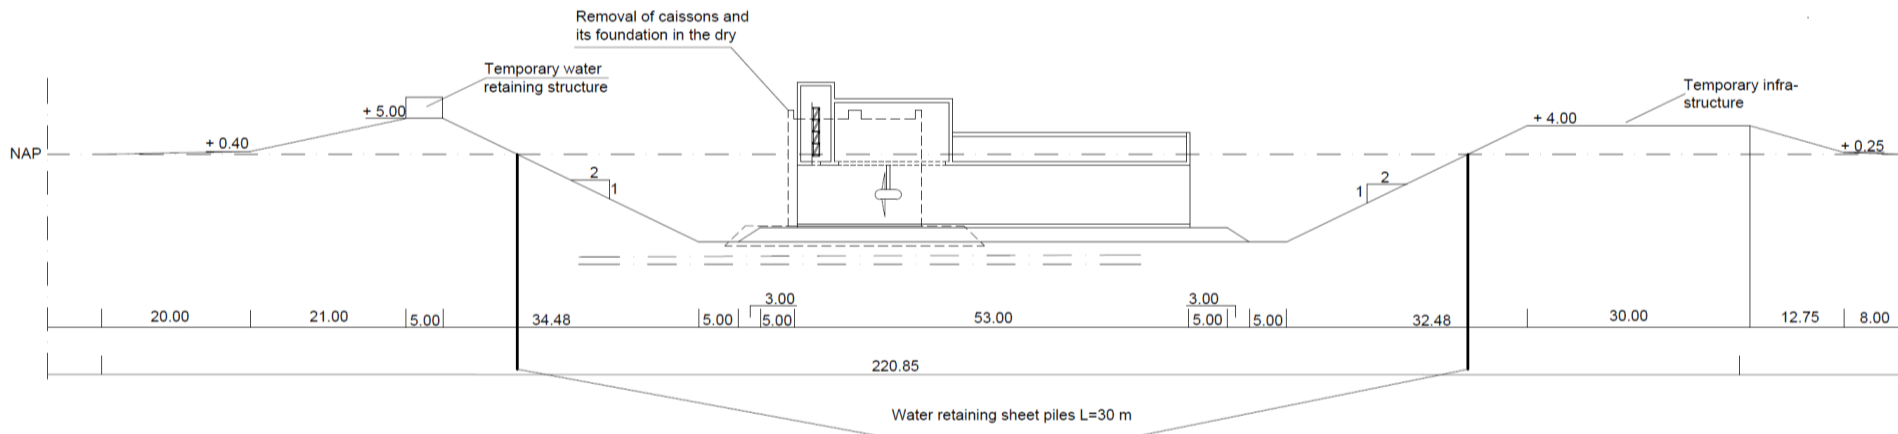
SKETCH CROSS-SECTION CONSTRUCTION METHOD IN THE DRY AT CAISSONS
